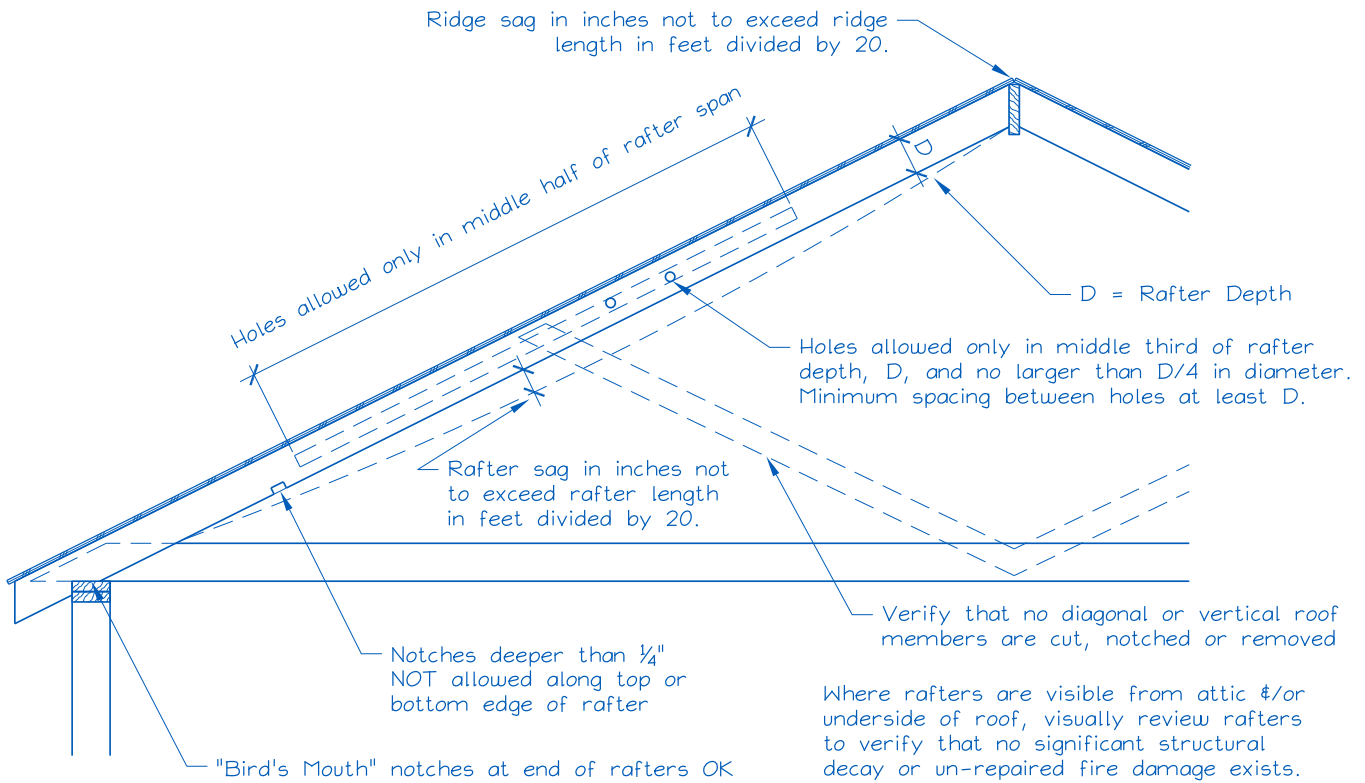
Roof Visual Structural Review (Contractor's Site Audit) of Existing Conditions.
